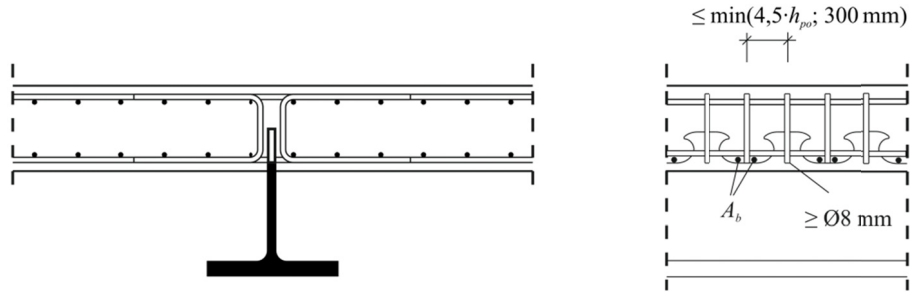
Detailing of reinforcement in composite girder with RC-slab and composite dowels.
